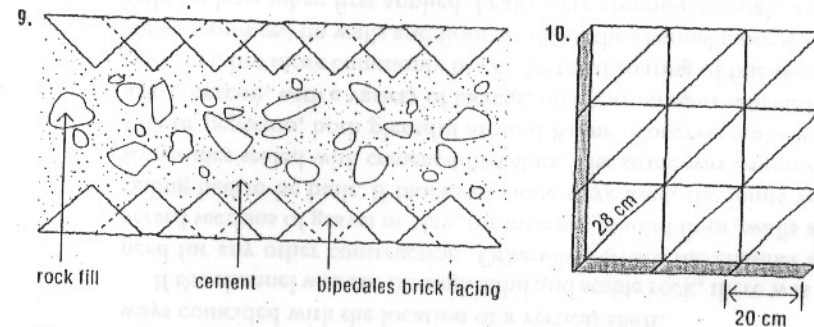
Wall or pier of brick-faced concrete, viewed from above.
